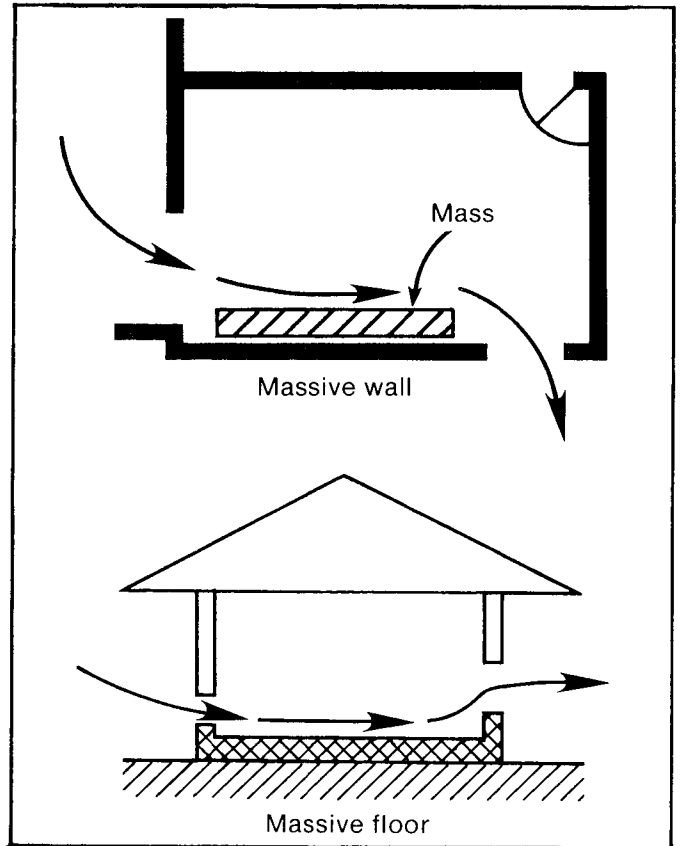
Window Locations to Create Wall Jets to Wash Massive Elements
